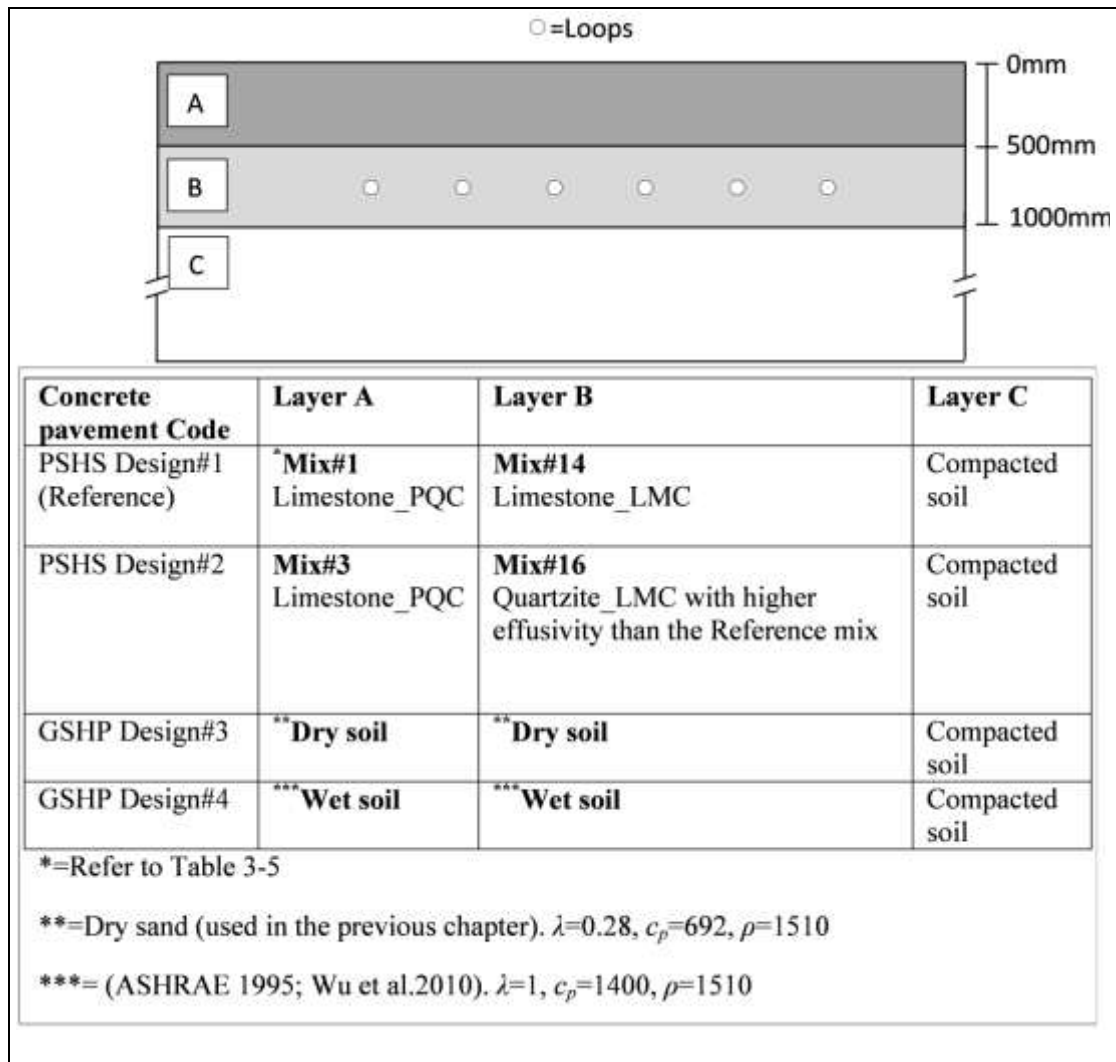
Pavement's cross-section considered for the PSHS simulation
